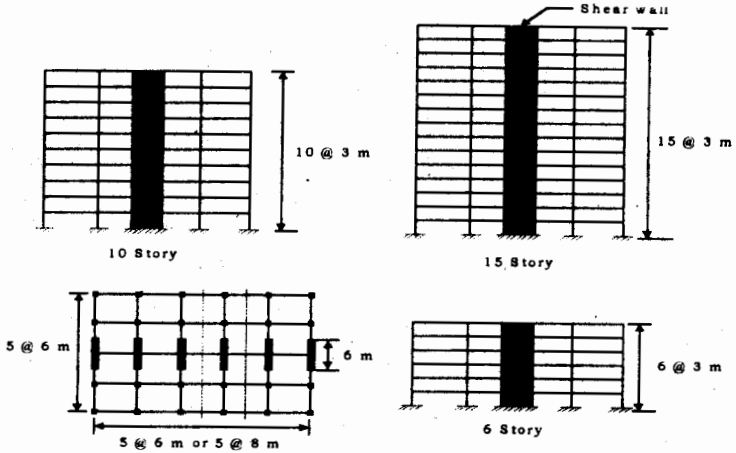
Plan and Elevation of 15-, 10- and 6-storeyed buildings studied
